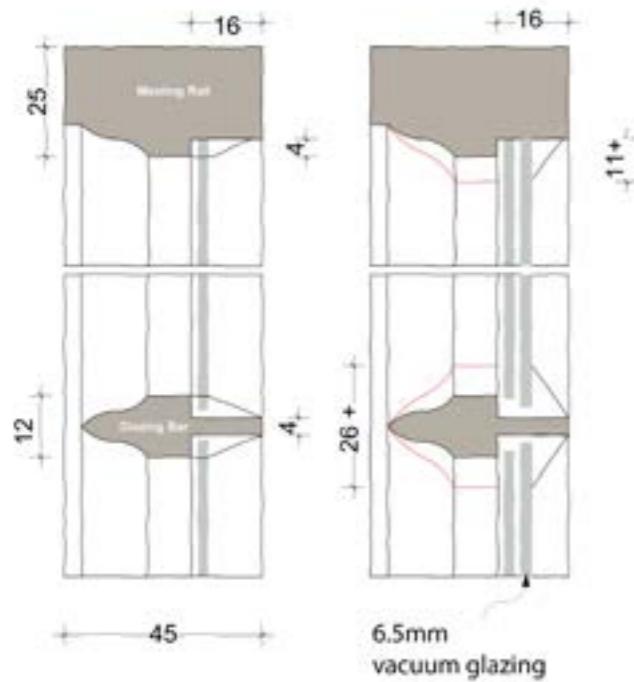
Check that new glazed units are compatible with existing frames and will fit within the rebates on the frame.
